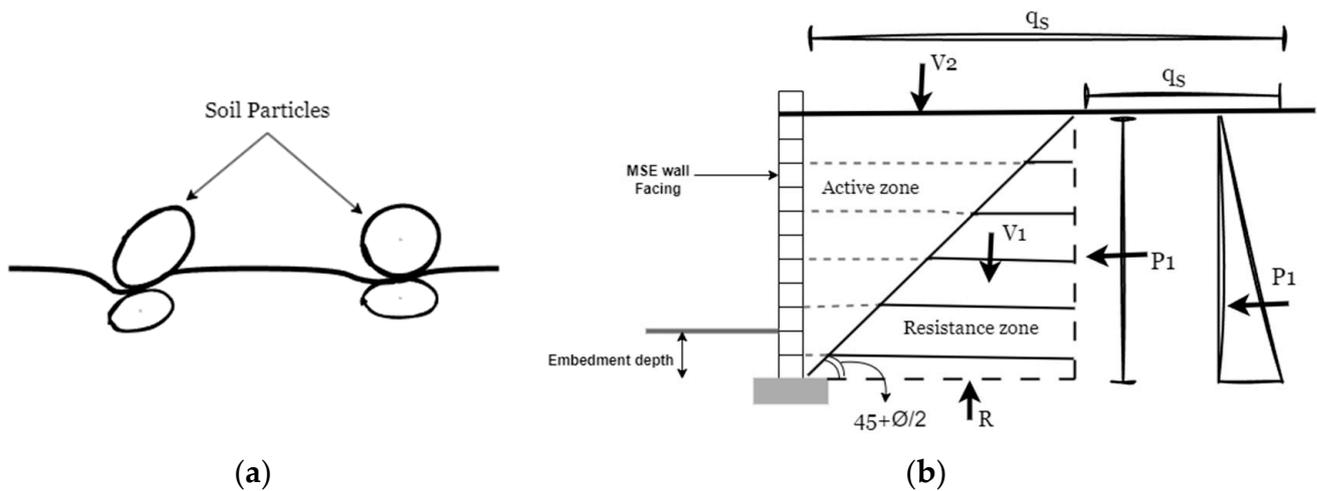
(a) The schematic of interaction between soil and (b) reinforcement and a reinforced soil retaining wall with the forces considered in the analysis of its external stability.
